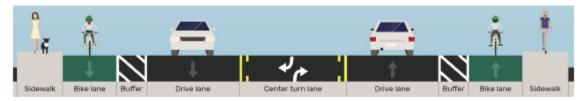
Typical Cross-Section—Alternative 3 (Road Diet)
